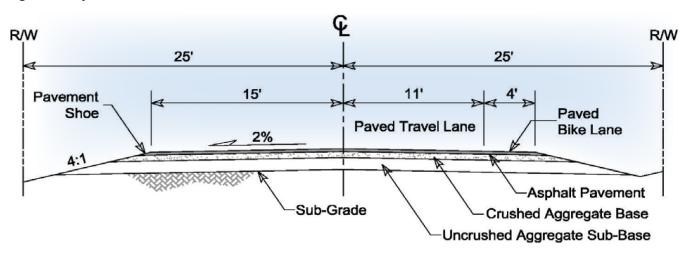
Possible Typical Roadway Section with Bike Lanes/Routes Source: provided by District Engineer, Nampa Highway District
